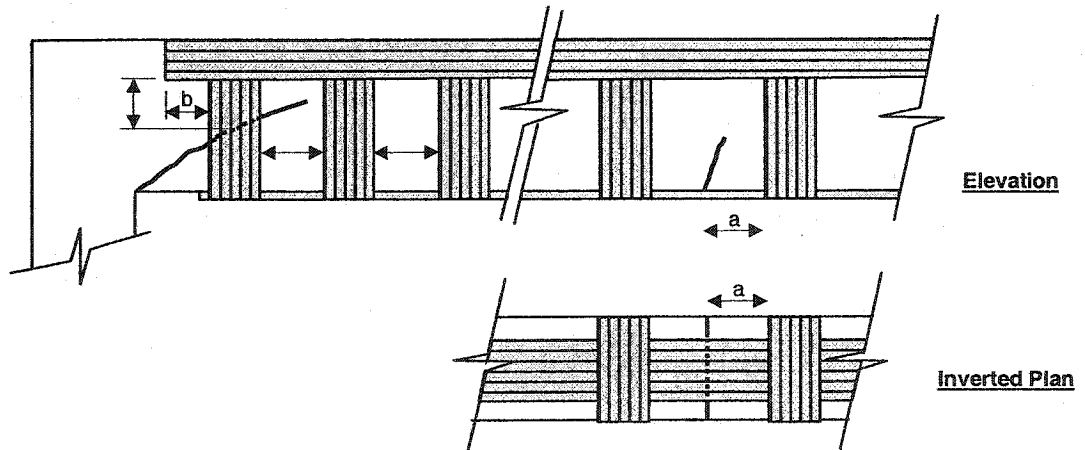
Concrete girder strengthened in flexure and shear with FRP sheets
